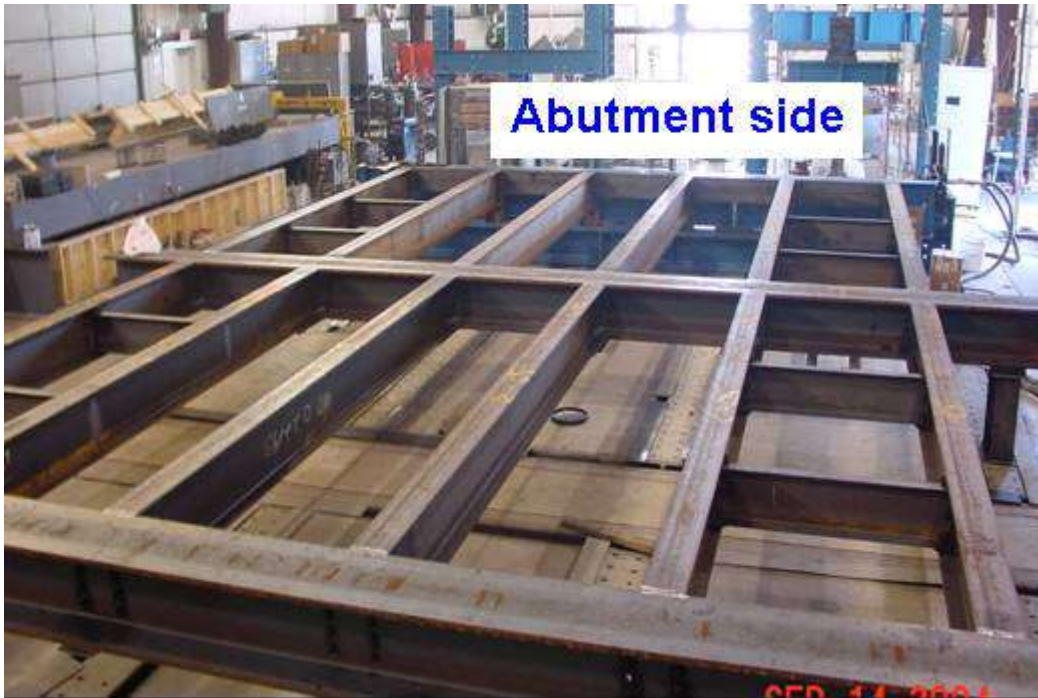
FRP deck superstructure built in the lab to mimic real structure
